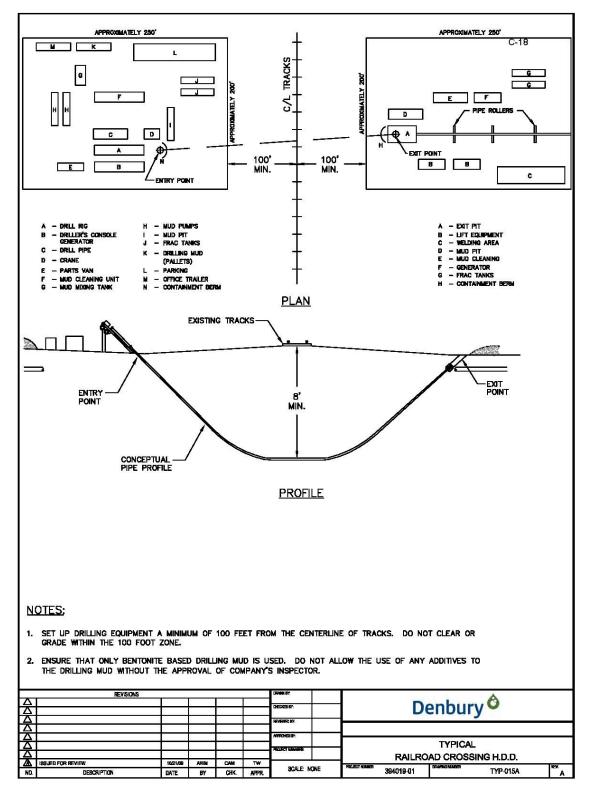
Typical horizontal direction drill railroad or road crossing.
